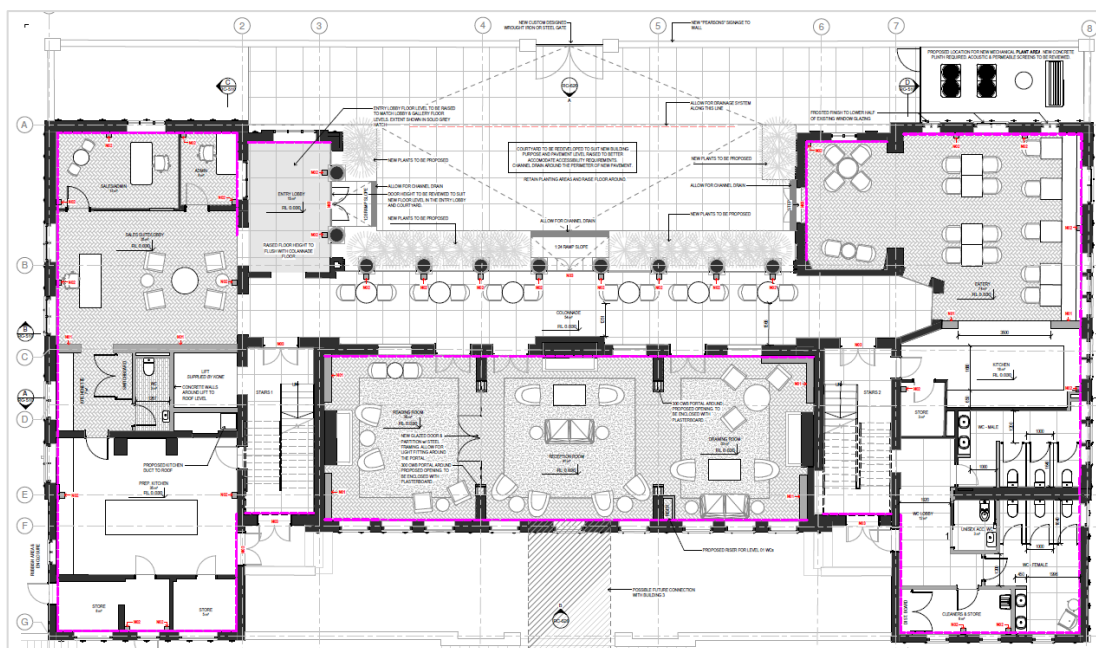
Approved Ground Floor Plan for Pearson House alterations approved 11/08/2022.
